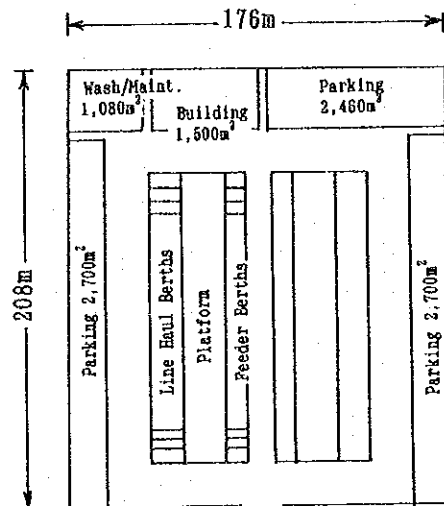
Minya Truck Terminal Schematic Layout
